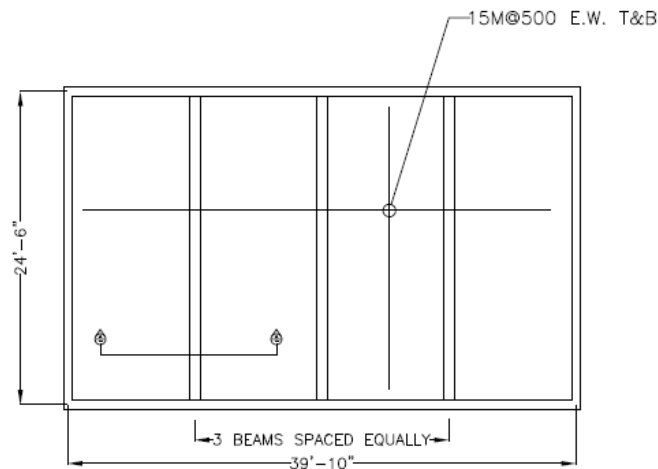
Typical Slab Reinforcement Layout – Northwest Wing of Structure
